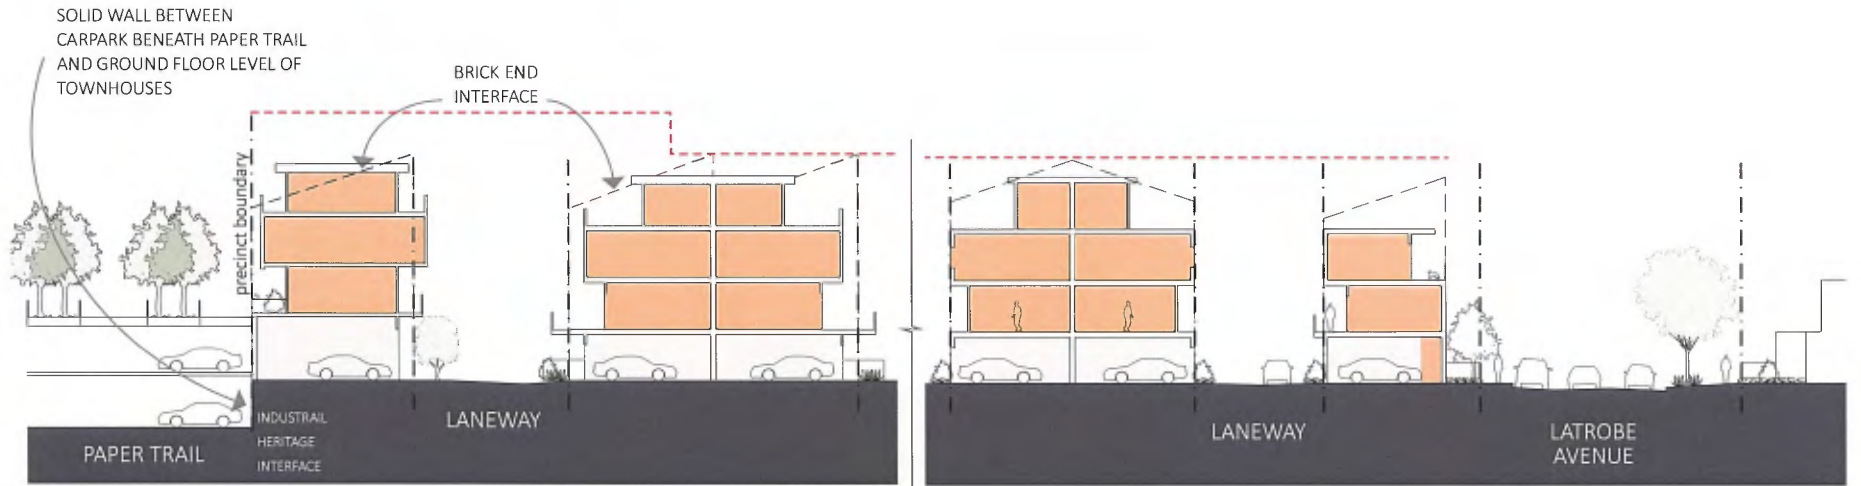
PRECINCT 5 INDICATIVE SECTION (LATROBE AVENUE TO PAPER TRAIL)
